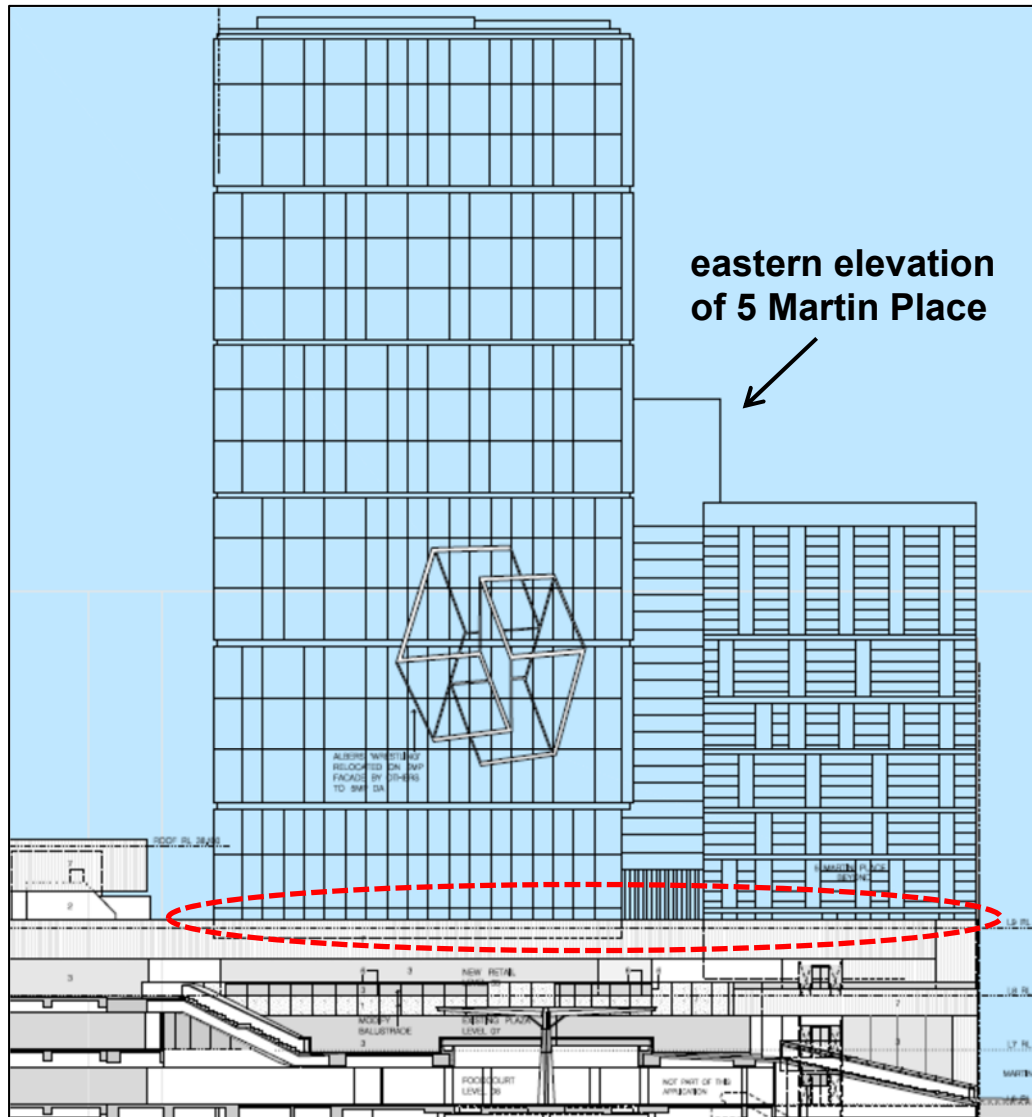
Sectional drawing illustrating the interface of the proposed podium addition with the eastern elevation of 5 Martin Place
